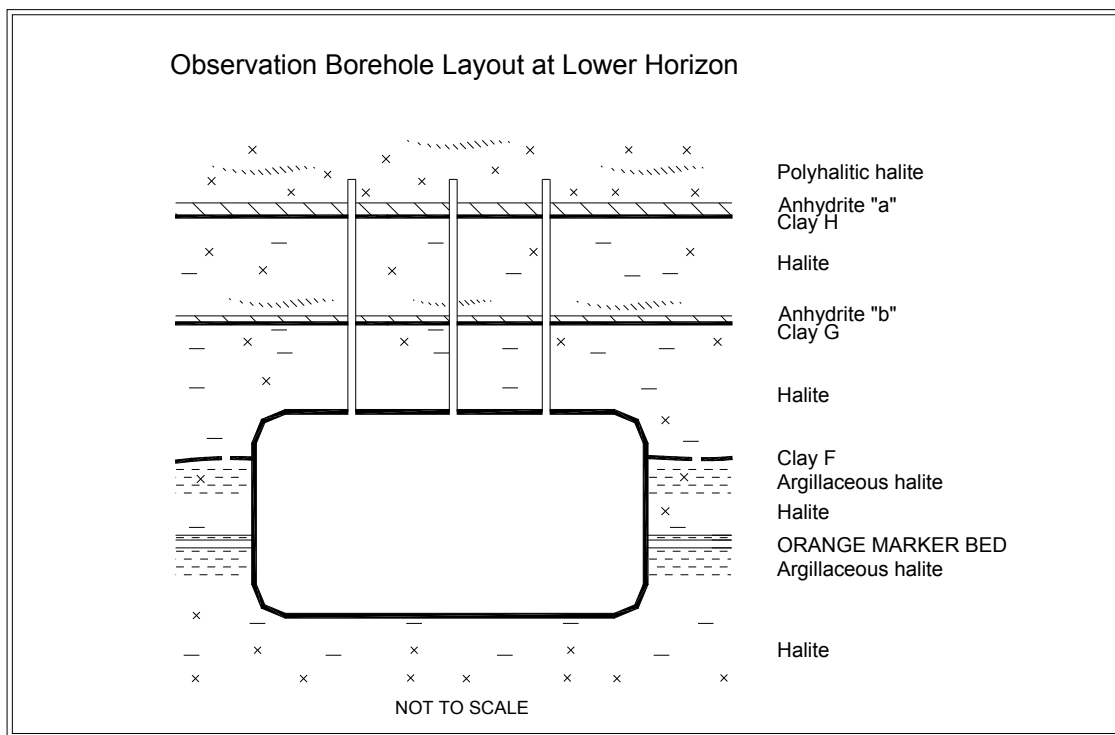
Example of Observation Hole Layout at Lower Horizon
